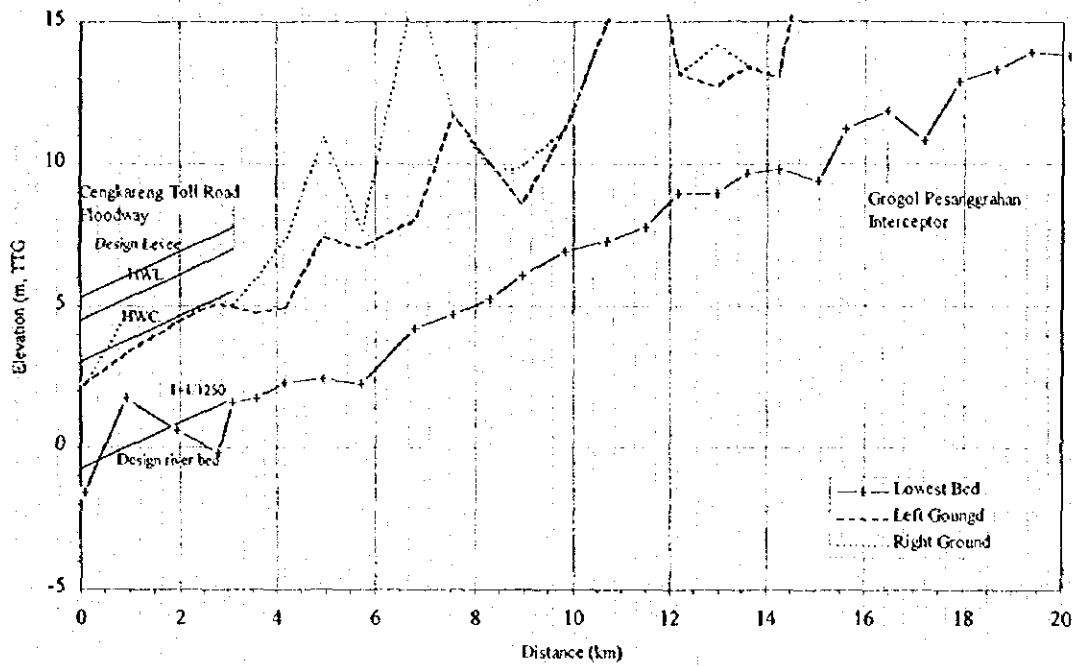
PROPOSED LONGITUDINAL PROFILE AND CROSS SECTION (7/13)
